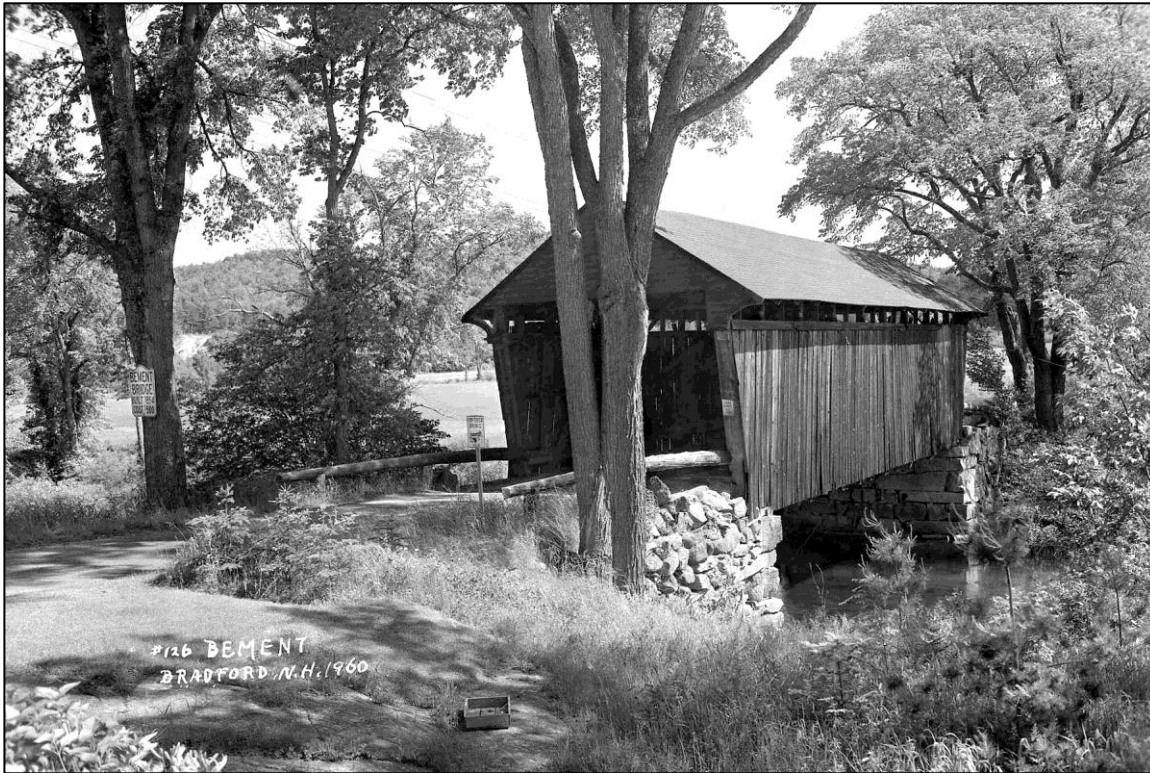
Bement Bridge, north portal and upstream side in 1960, showing new asphalt roof and alteration of portal made in 1954 (source: Town of Bradford).
